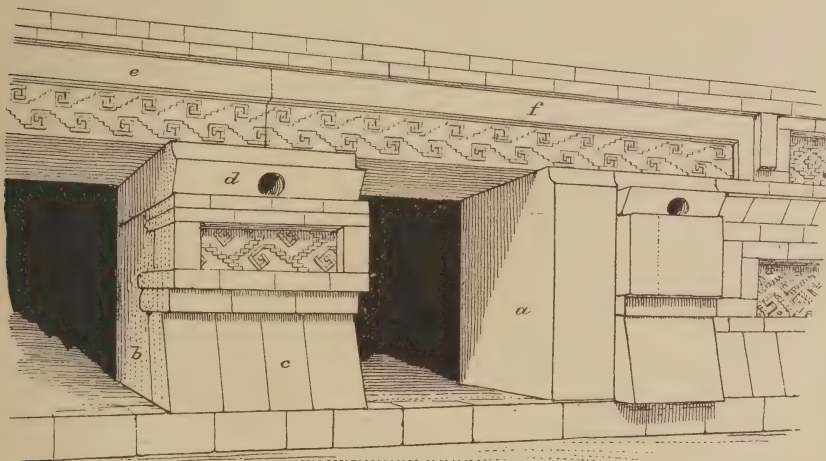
CONSTRUCTION OF TRIPLE DOORWAY, ONE-HALF ONLY BEING SHOWN.
